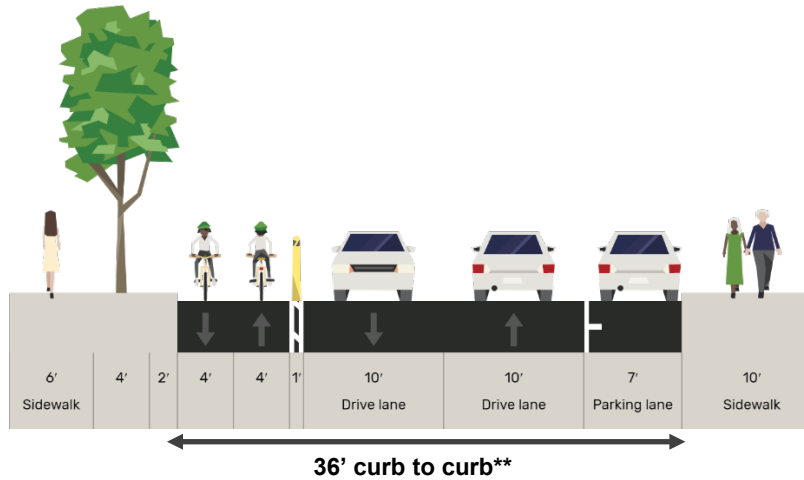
Section A (Butler Street - 57th Street to Sawyer Street) – Proposed Option 2
